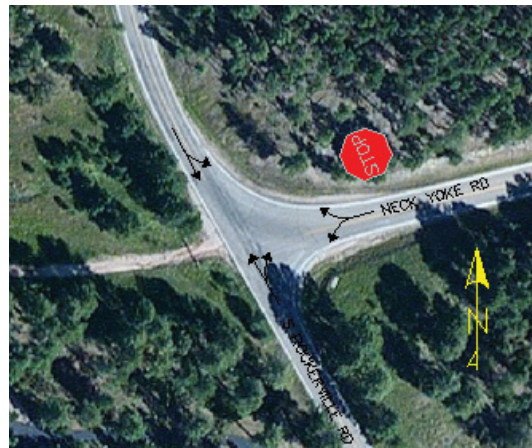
S Rockerville Road & Neck Yoke Rd Intersection Configuration
